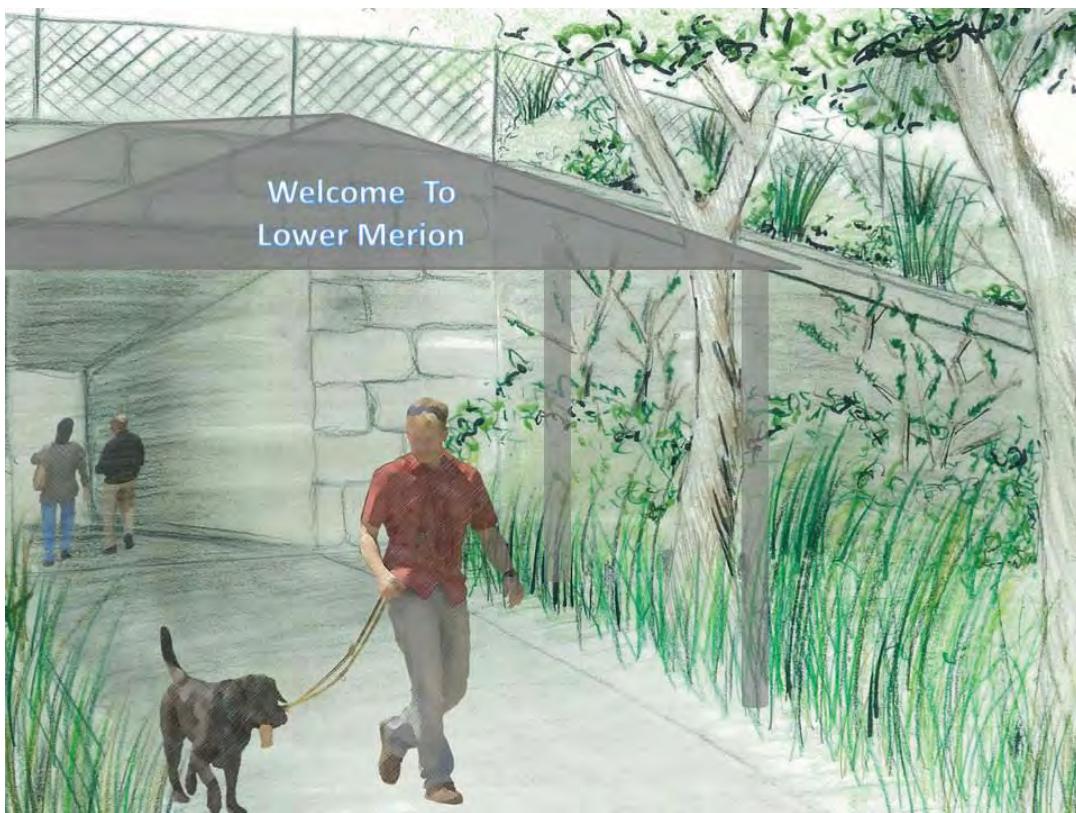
Rendering of NS Railroad bridge after with NS required Canopy
